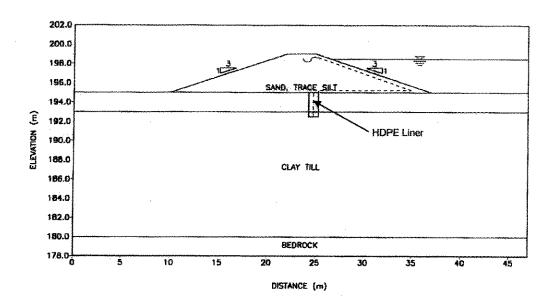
Proposed Layout of HDPE Liner (Option 1)
